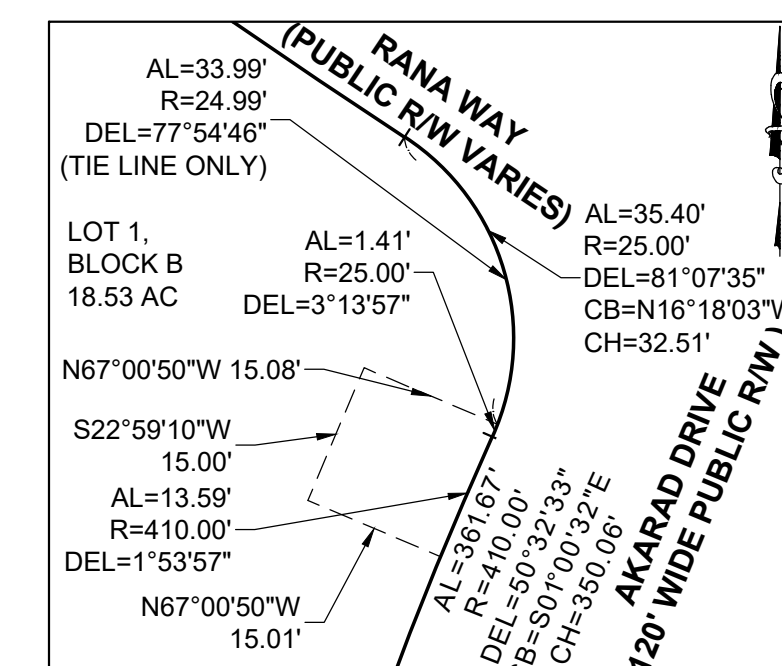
DETAIL C, PUBLIC REUSE MAIN, EXISTING PUBLIC SIDEWALK AND 12' PUBLIC SIDEWALK EASEMENTS (SEE SHEETS 6 AND 7)
